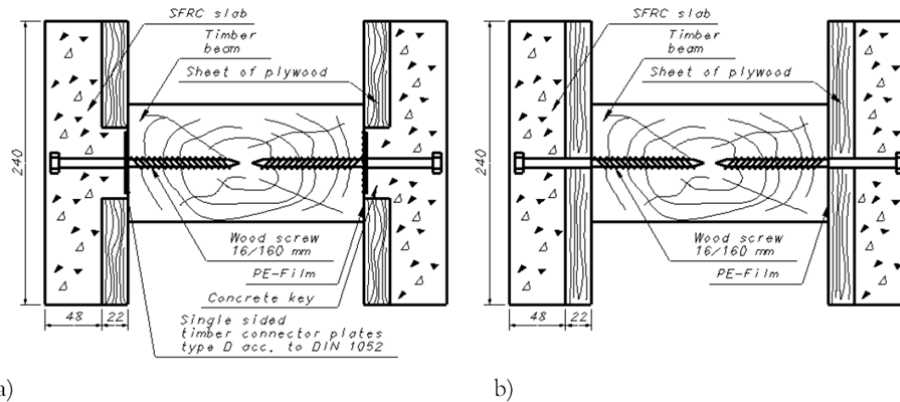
SFRC-timber composite specimen with concrete key (a) and without concrete key (b) (dimensions in mm)
